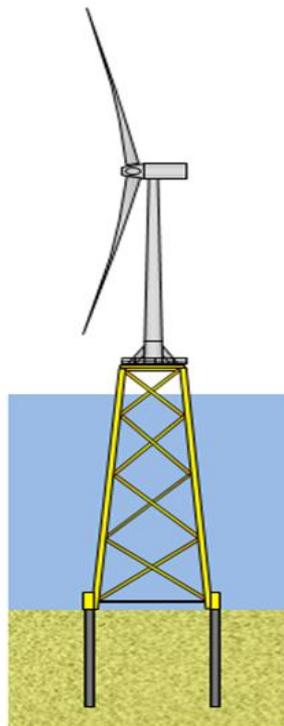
Outline Design of the Proposed Jacket on Pin Pile Foundation
